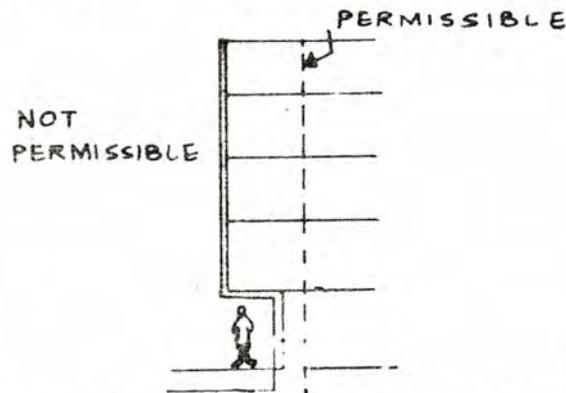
ROUTES FOR DOWN CONDUCTORS IN A BUILDING WITH CANTILEVERED UPPER FLOORS
